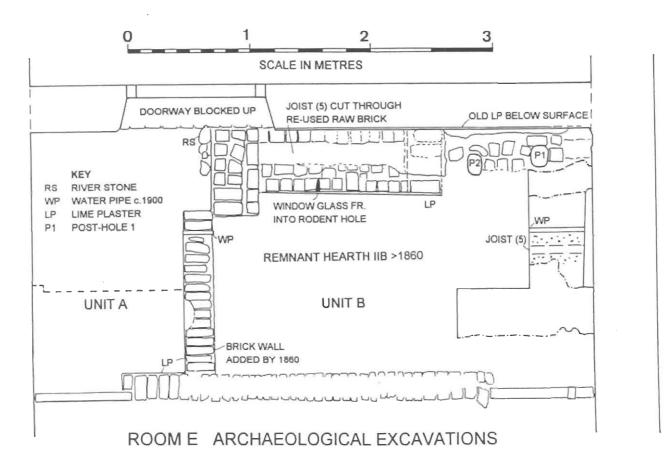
Partial plan of Room E, detailing the excavation of the diminished hearth IIB phase 2. It was demolished in about 1870 when the floor boards were installed.
